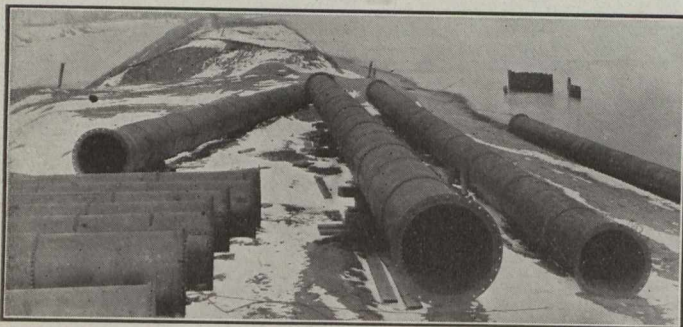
Sections of Beach Intake Pipe Before Placing.
